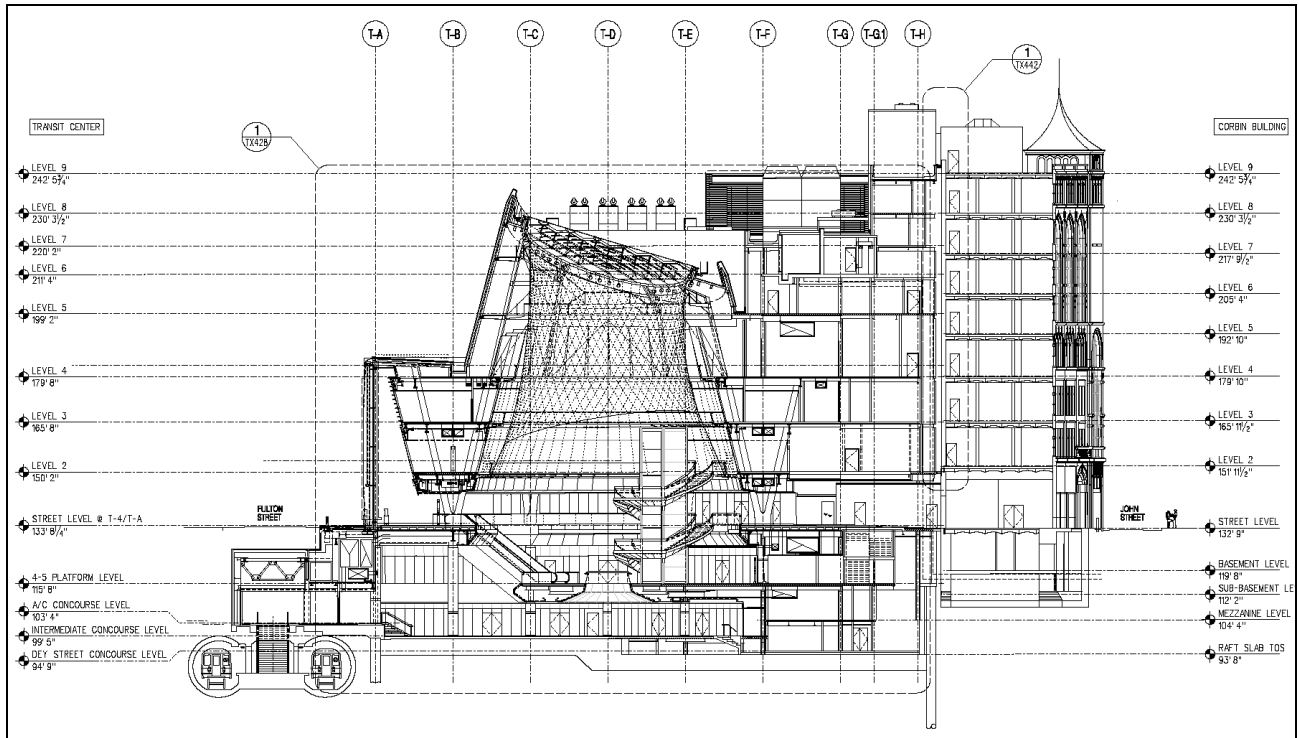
Cross section through the Transit Center and Corbin Building, facing east. The contract included all structural elements at Street Level and below, minus the upgrade work to the A/C station beneath Fulton Street.
